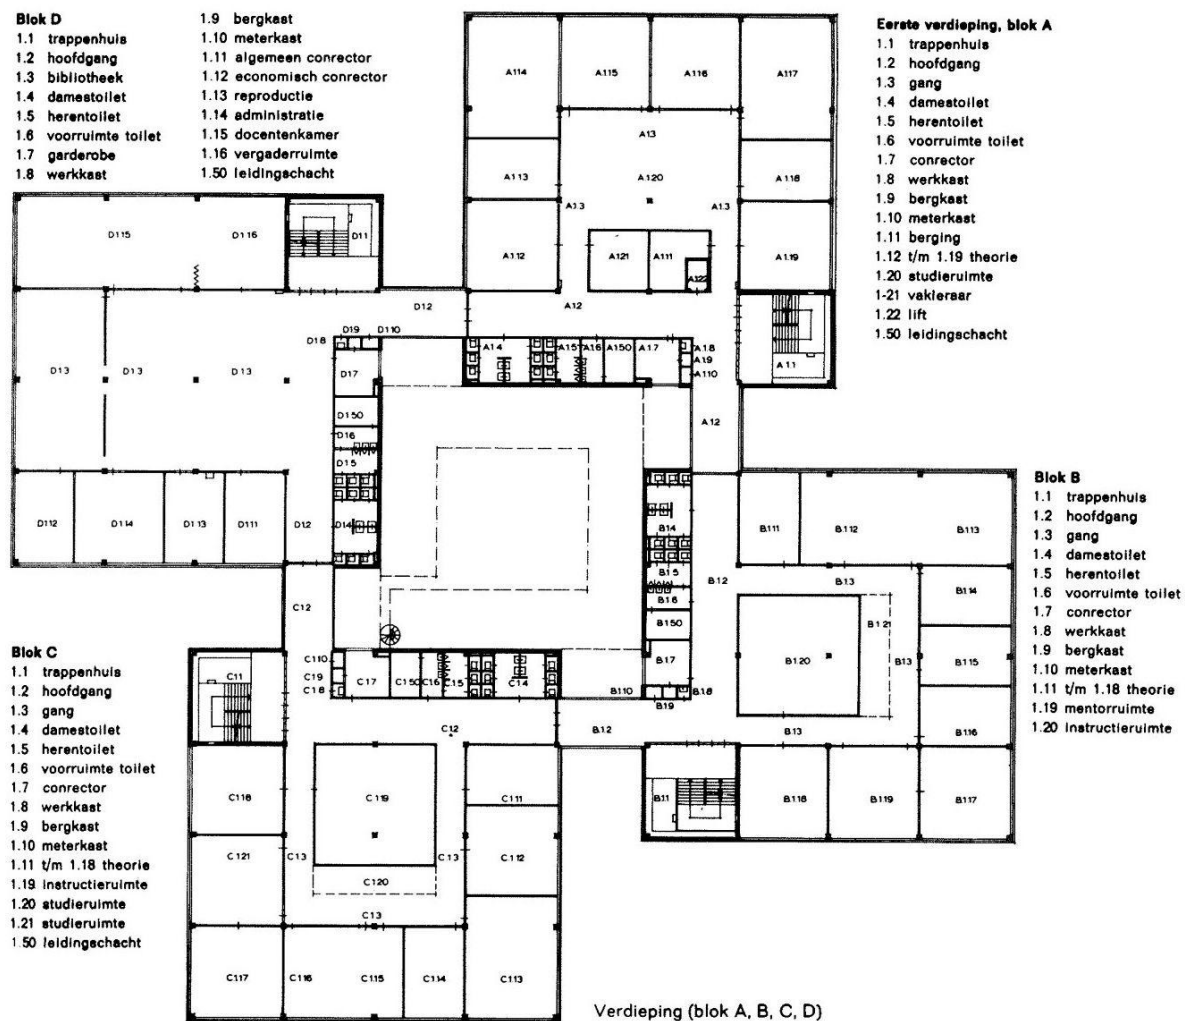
Floor plan of the first floor, 1973. (source: (Van den Bosch et al., 1980, p. 119).
